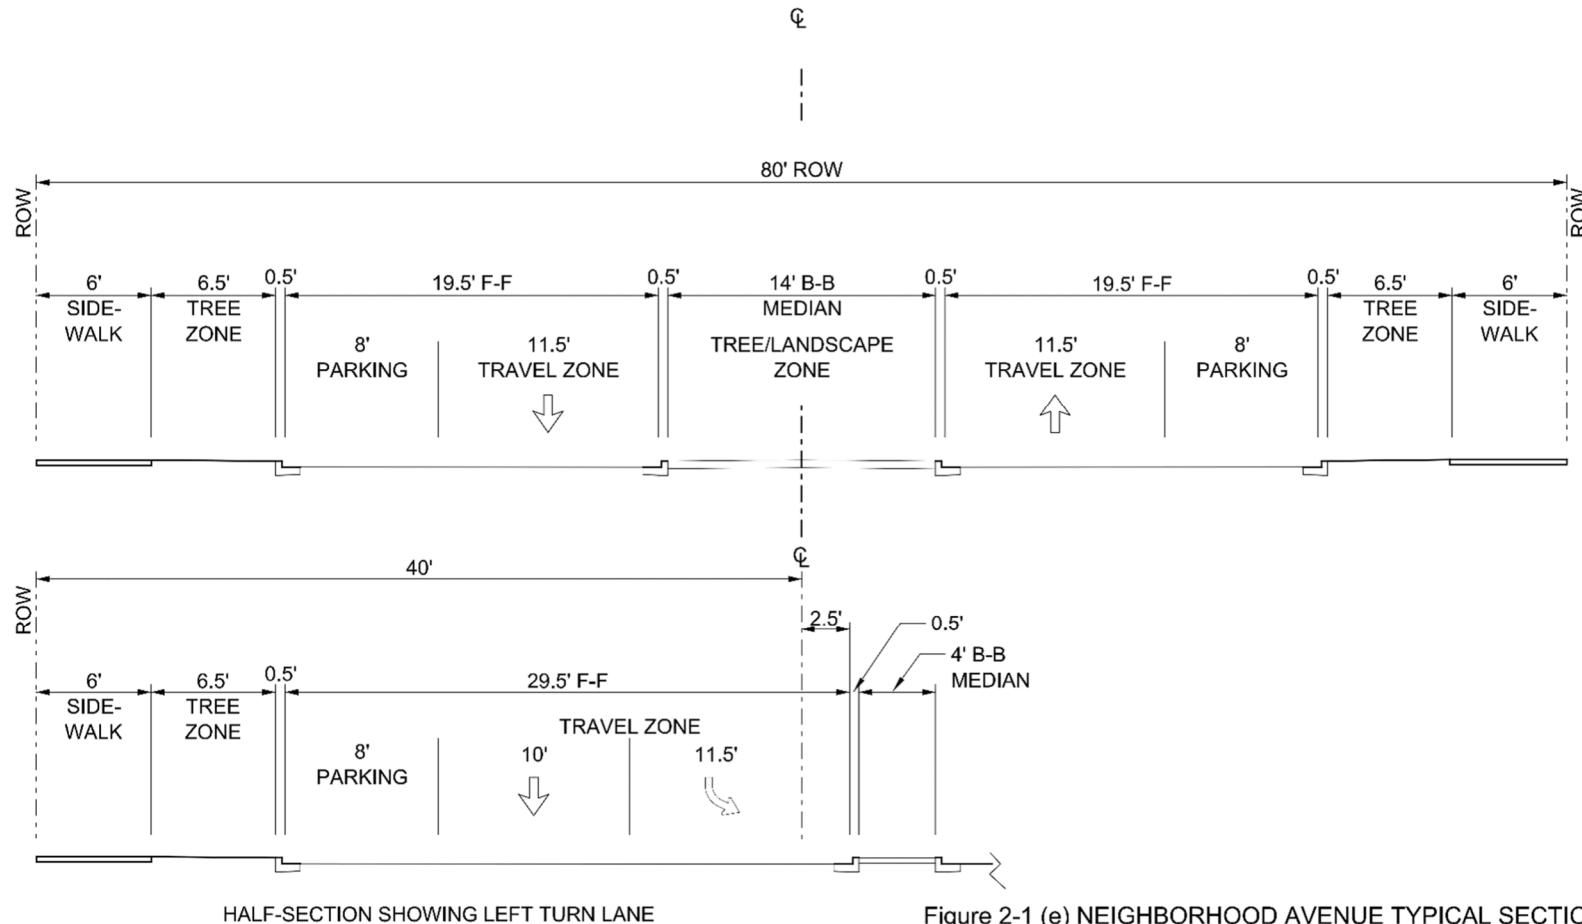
(e) NEIGHBORHOOD AVENUE TYPICAL SECTION
